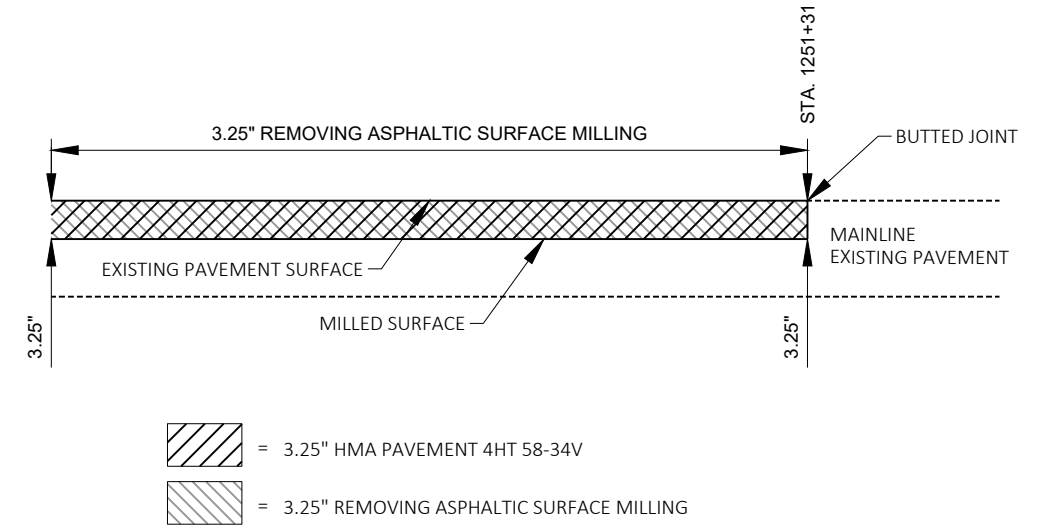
DETAIL OF PAVED SIDE ROAD BUTTED JOINT - URBAN (NO GRADE RAISE)
